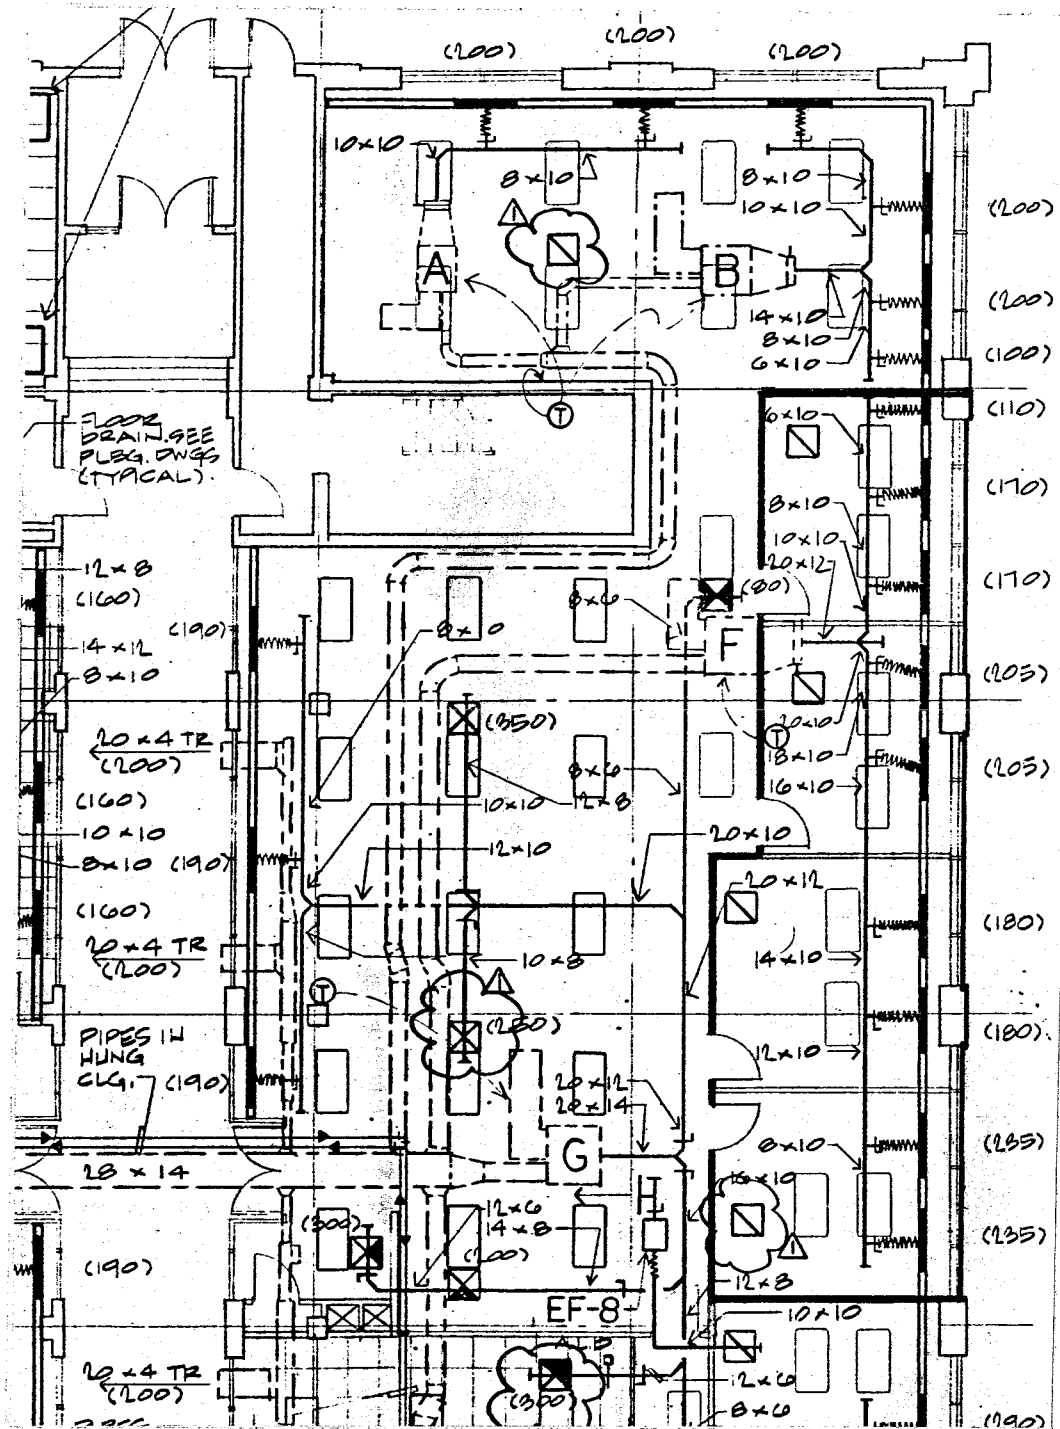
Mechanical plan of the four instrumented offices and surrounding area (outlined at the right). The windows face East. The terminal box labeled "F" is the one replaced. Detail shown in Figure 3.8. Source: Haines Lundberg Waehler, New York, N.Y., (for Dow Jones) drawing M-1, revised 8/20/84.
